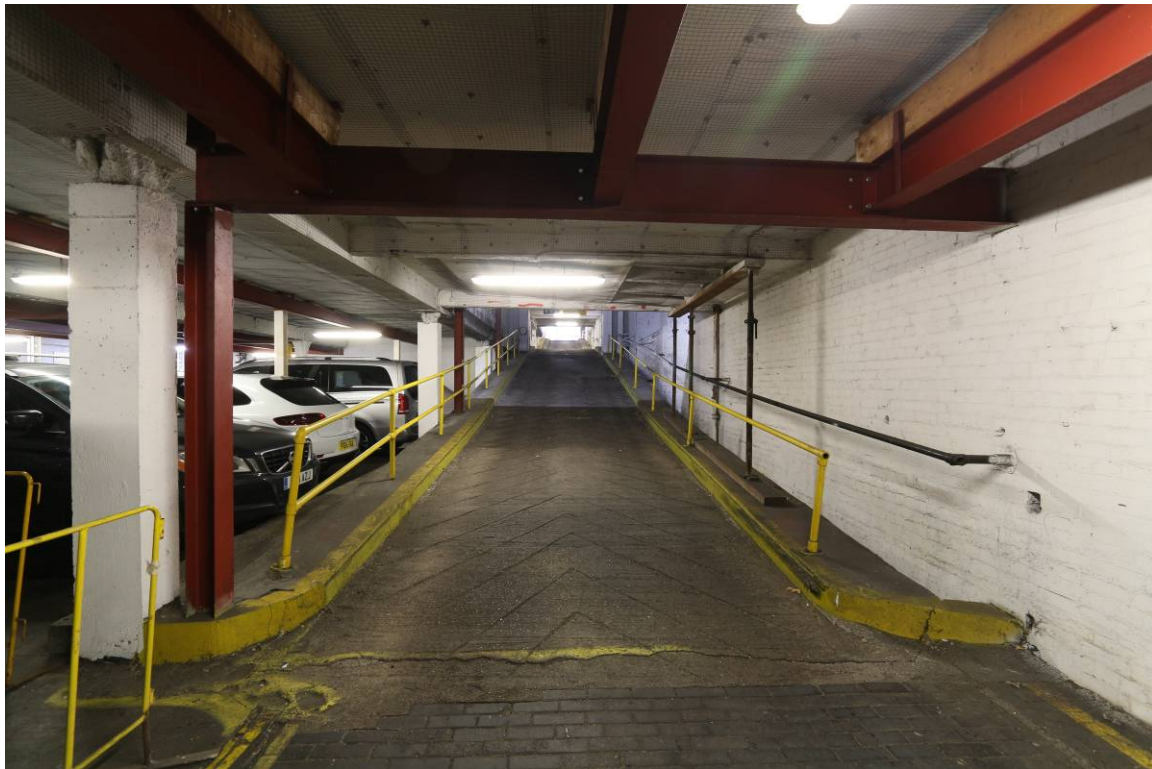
Ramp from upper ground floor level to first floor level, looking west
